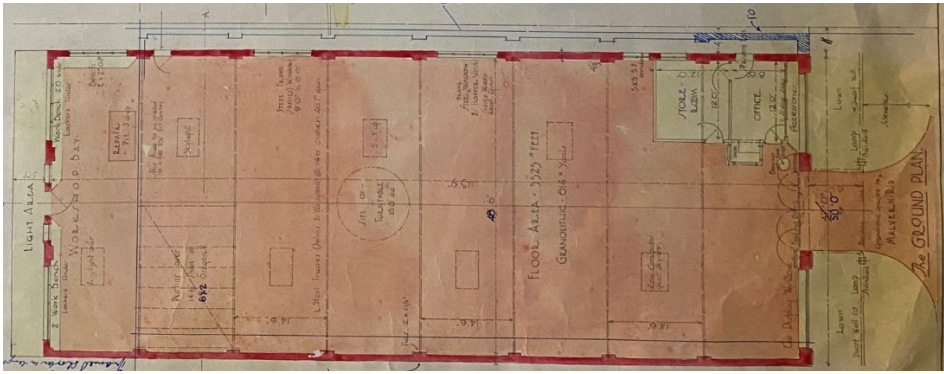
The ground plan of the earlier proposed design for the brick garage. North is right (SHC MB5178).
